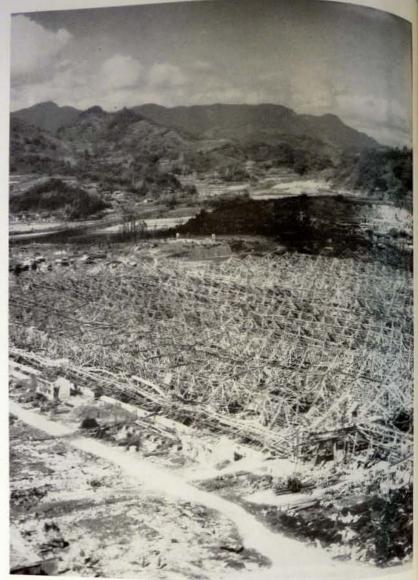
4,500 feet from GZ. Group 4. Building 22. Aerial view looking northwest.
